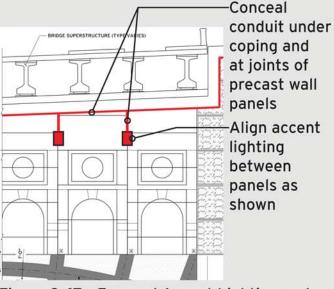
Focused Accent Lighting and Conduit Layout at Abutments
